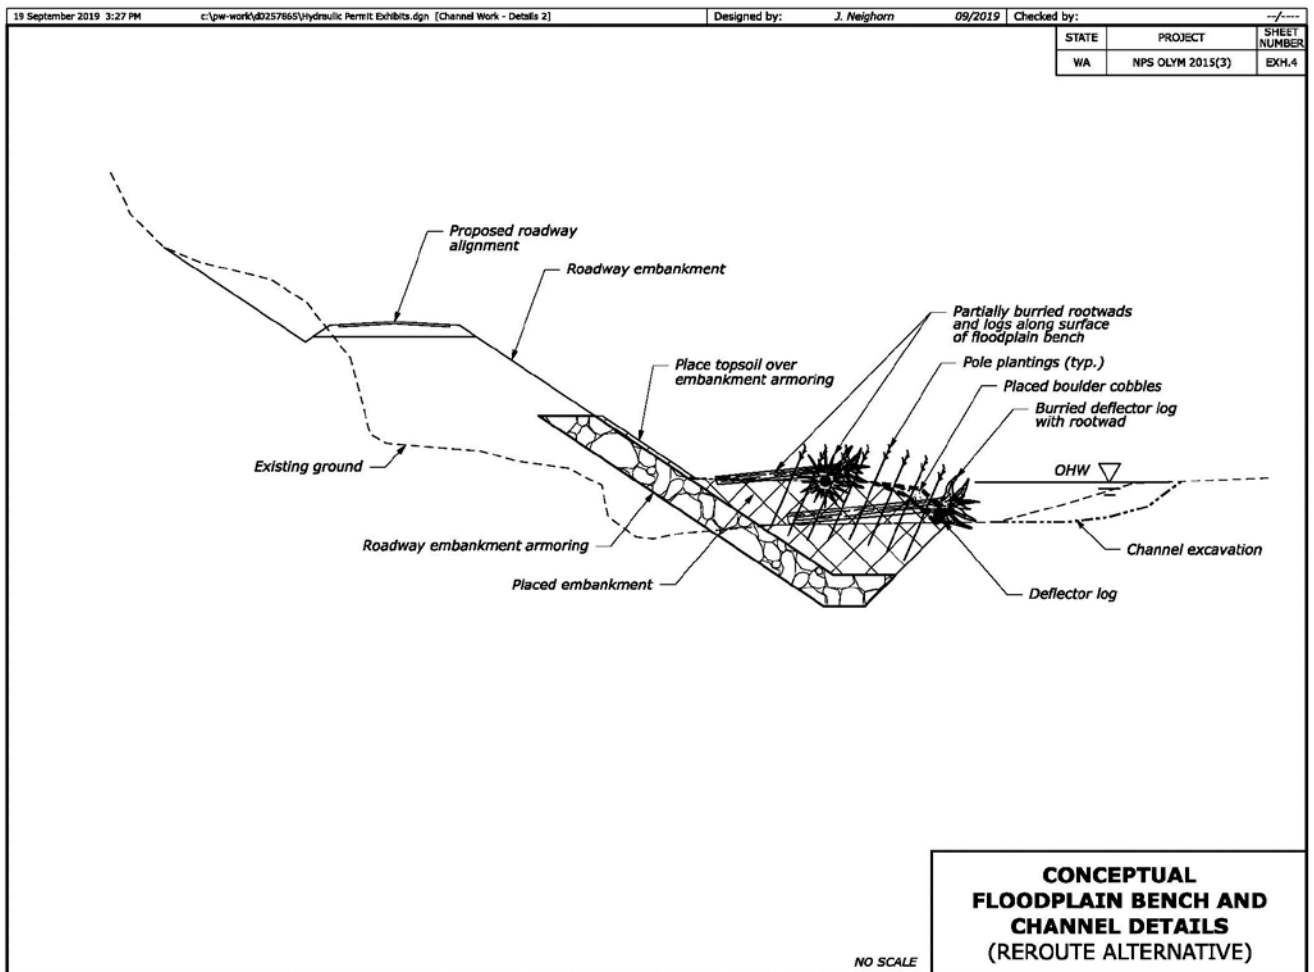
Reroute Conceptual Floodplain Bench and Channel Details
